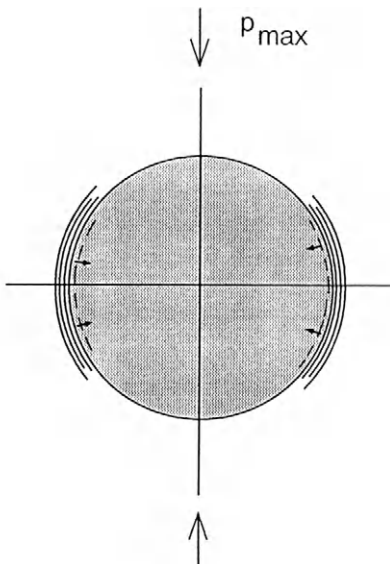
“Spalling” in boreholes and drilled tunnels
